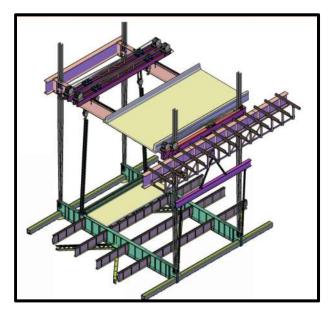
Isometric View of Winch System Lowering Existing Roadway
